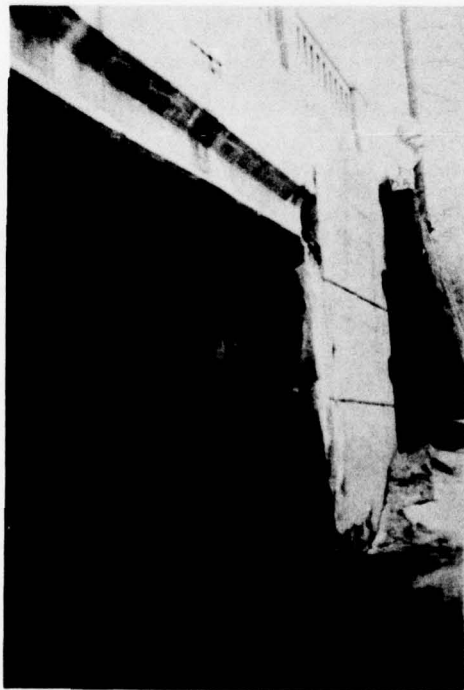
Left bridge abutment, at low tide, low level outlets closed; showing timber pile supported downstream retaining wall
